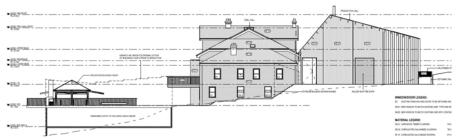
North-western elevation showing the interaction between the existing Drill Hall building and other retained buildings/structures (middle and left) and the proposed 'Production Hall' building (right) (Source: Application Documents - John Wardle Architects).
